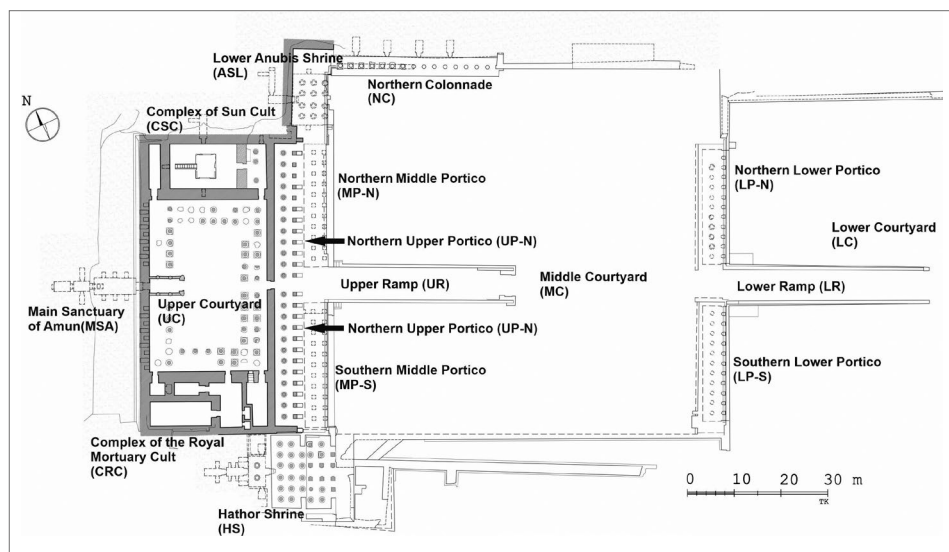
Plan of the Temple of Hatshepsut (Drawing T. Dziedzic)
